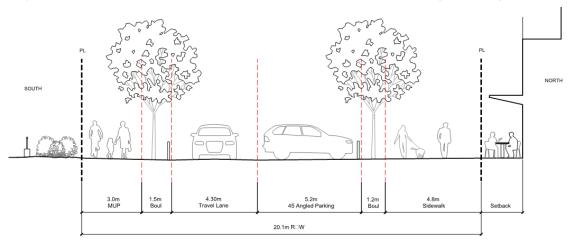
Typical Section of 1 travel lane (Eastbound), MUP and Angled Parking
